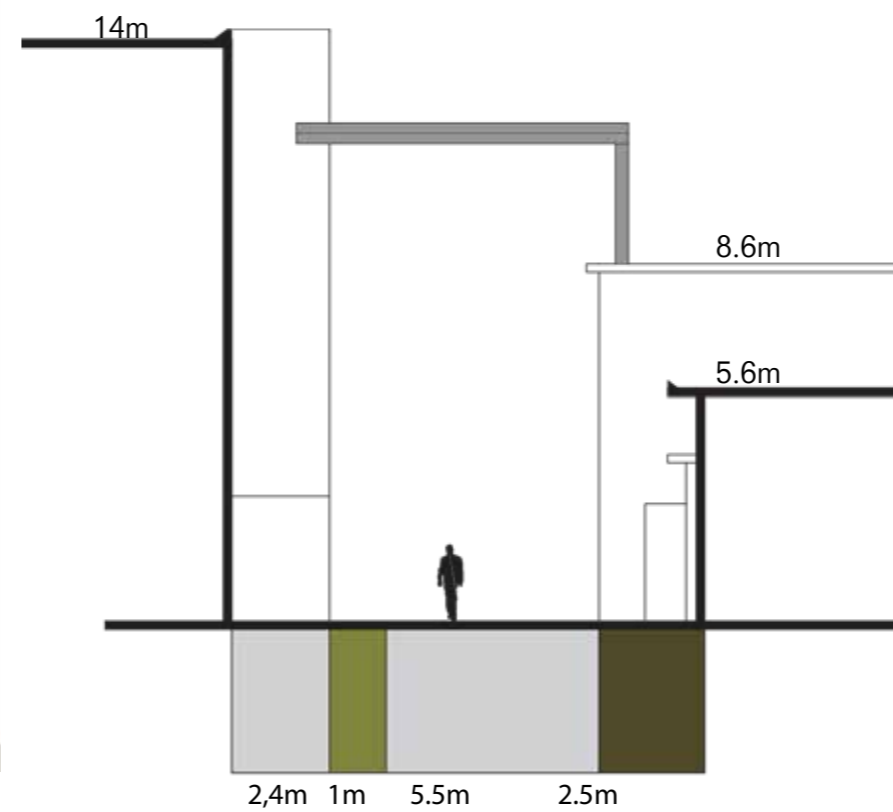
Streetview and profile Wamperserij towards the West
